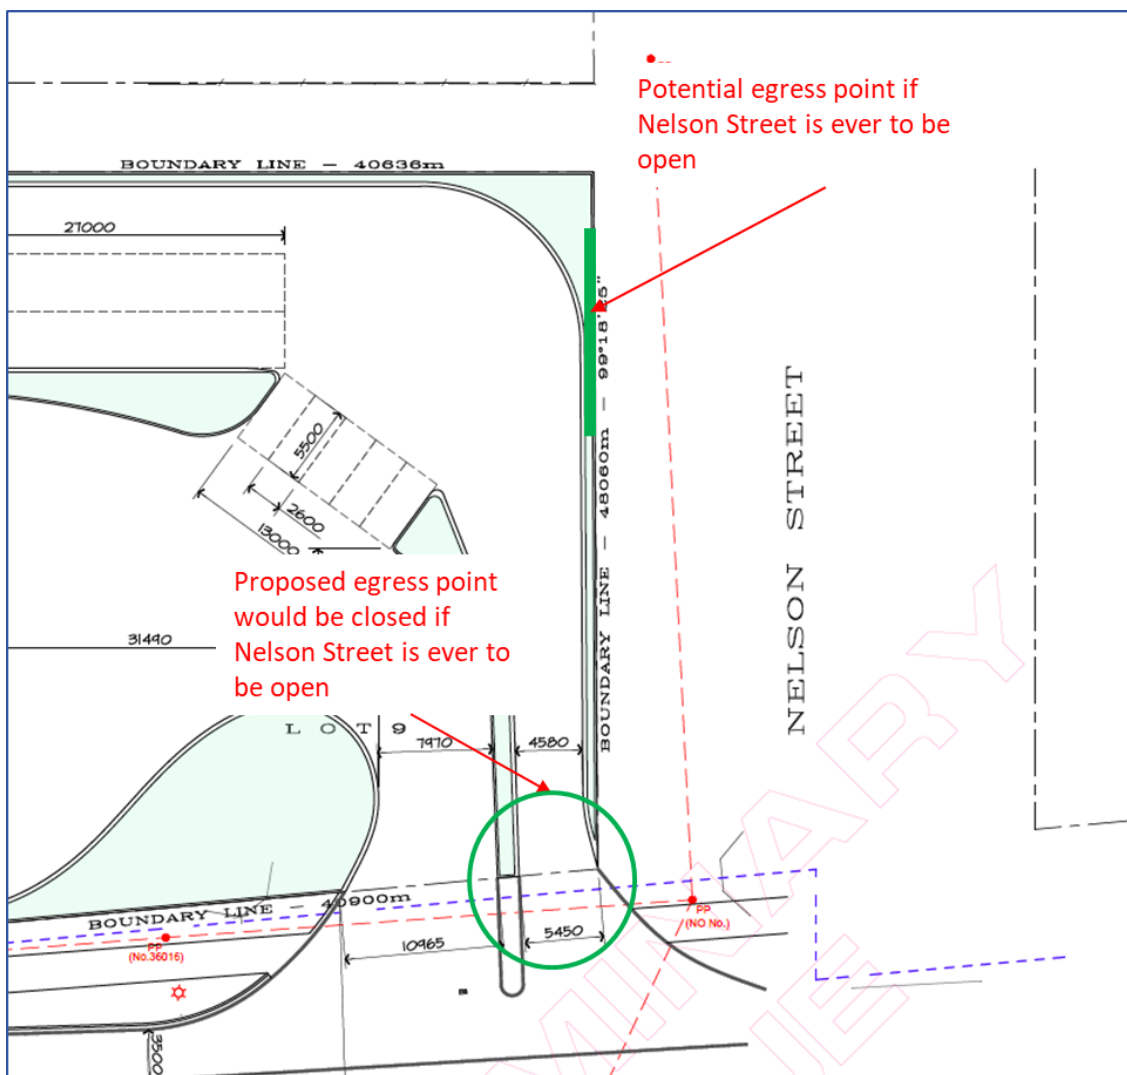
Potential modification of egress point if Nelson Street ever to be open
